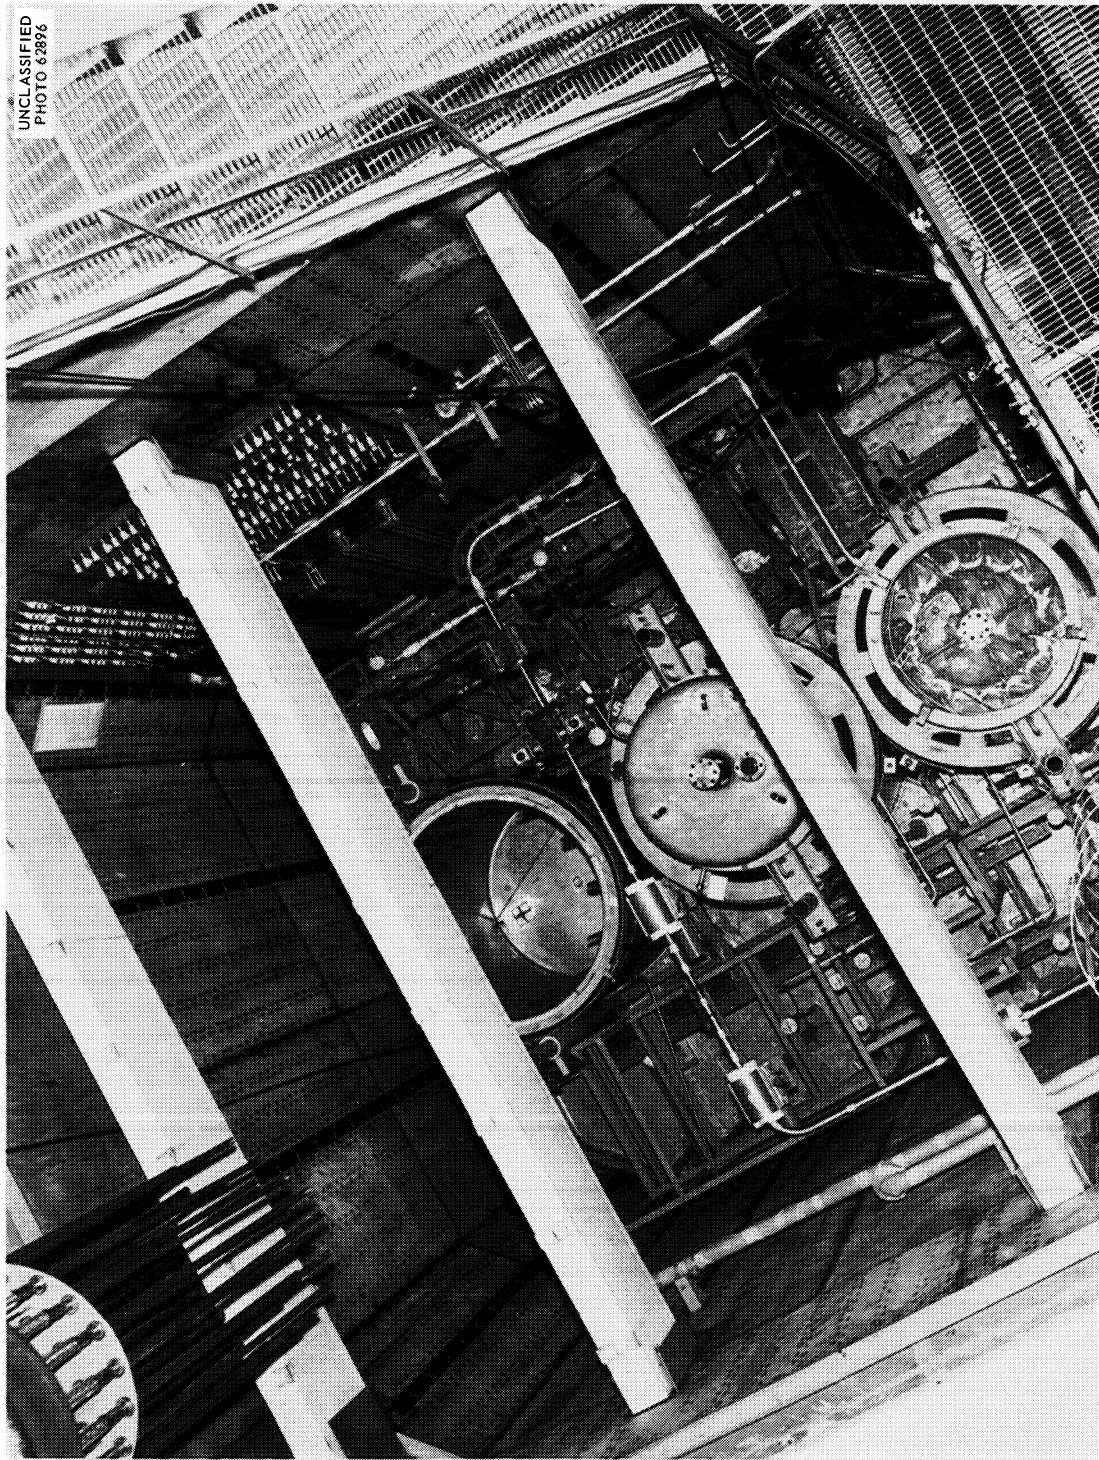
Drain-Tank Cell, Showing Assembly of Steam Dome Cooling System for Fuel Drain Tanks.
